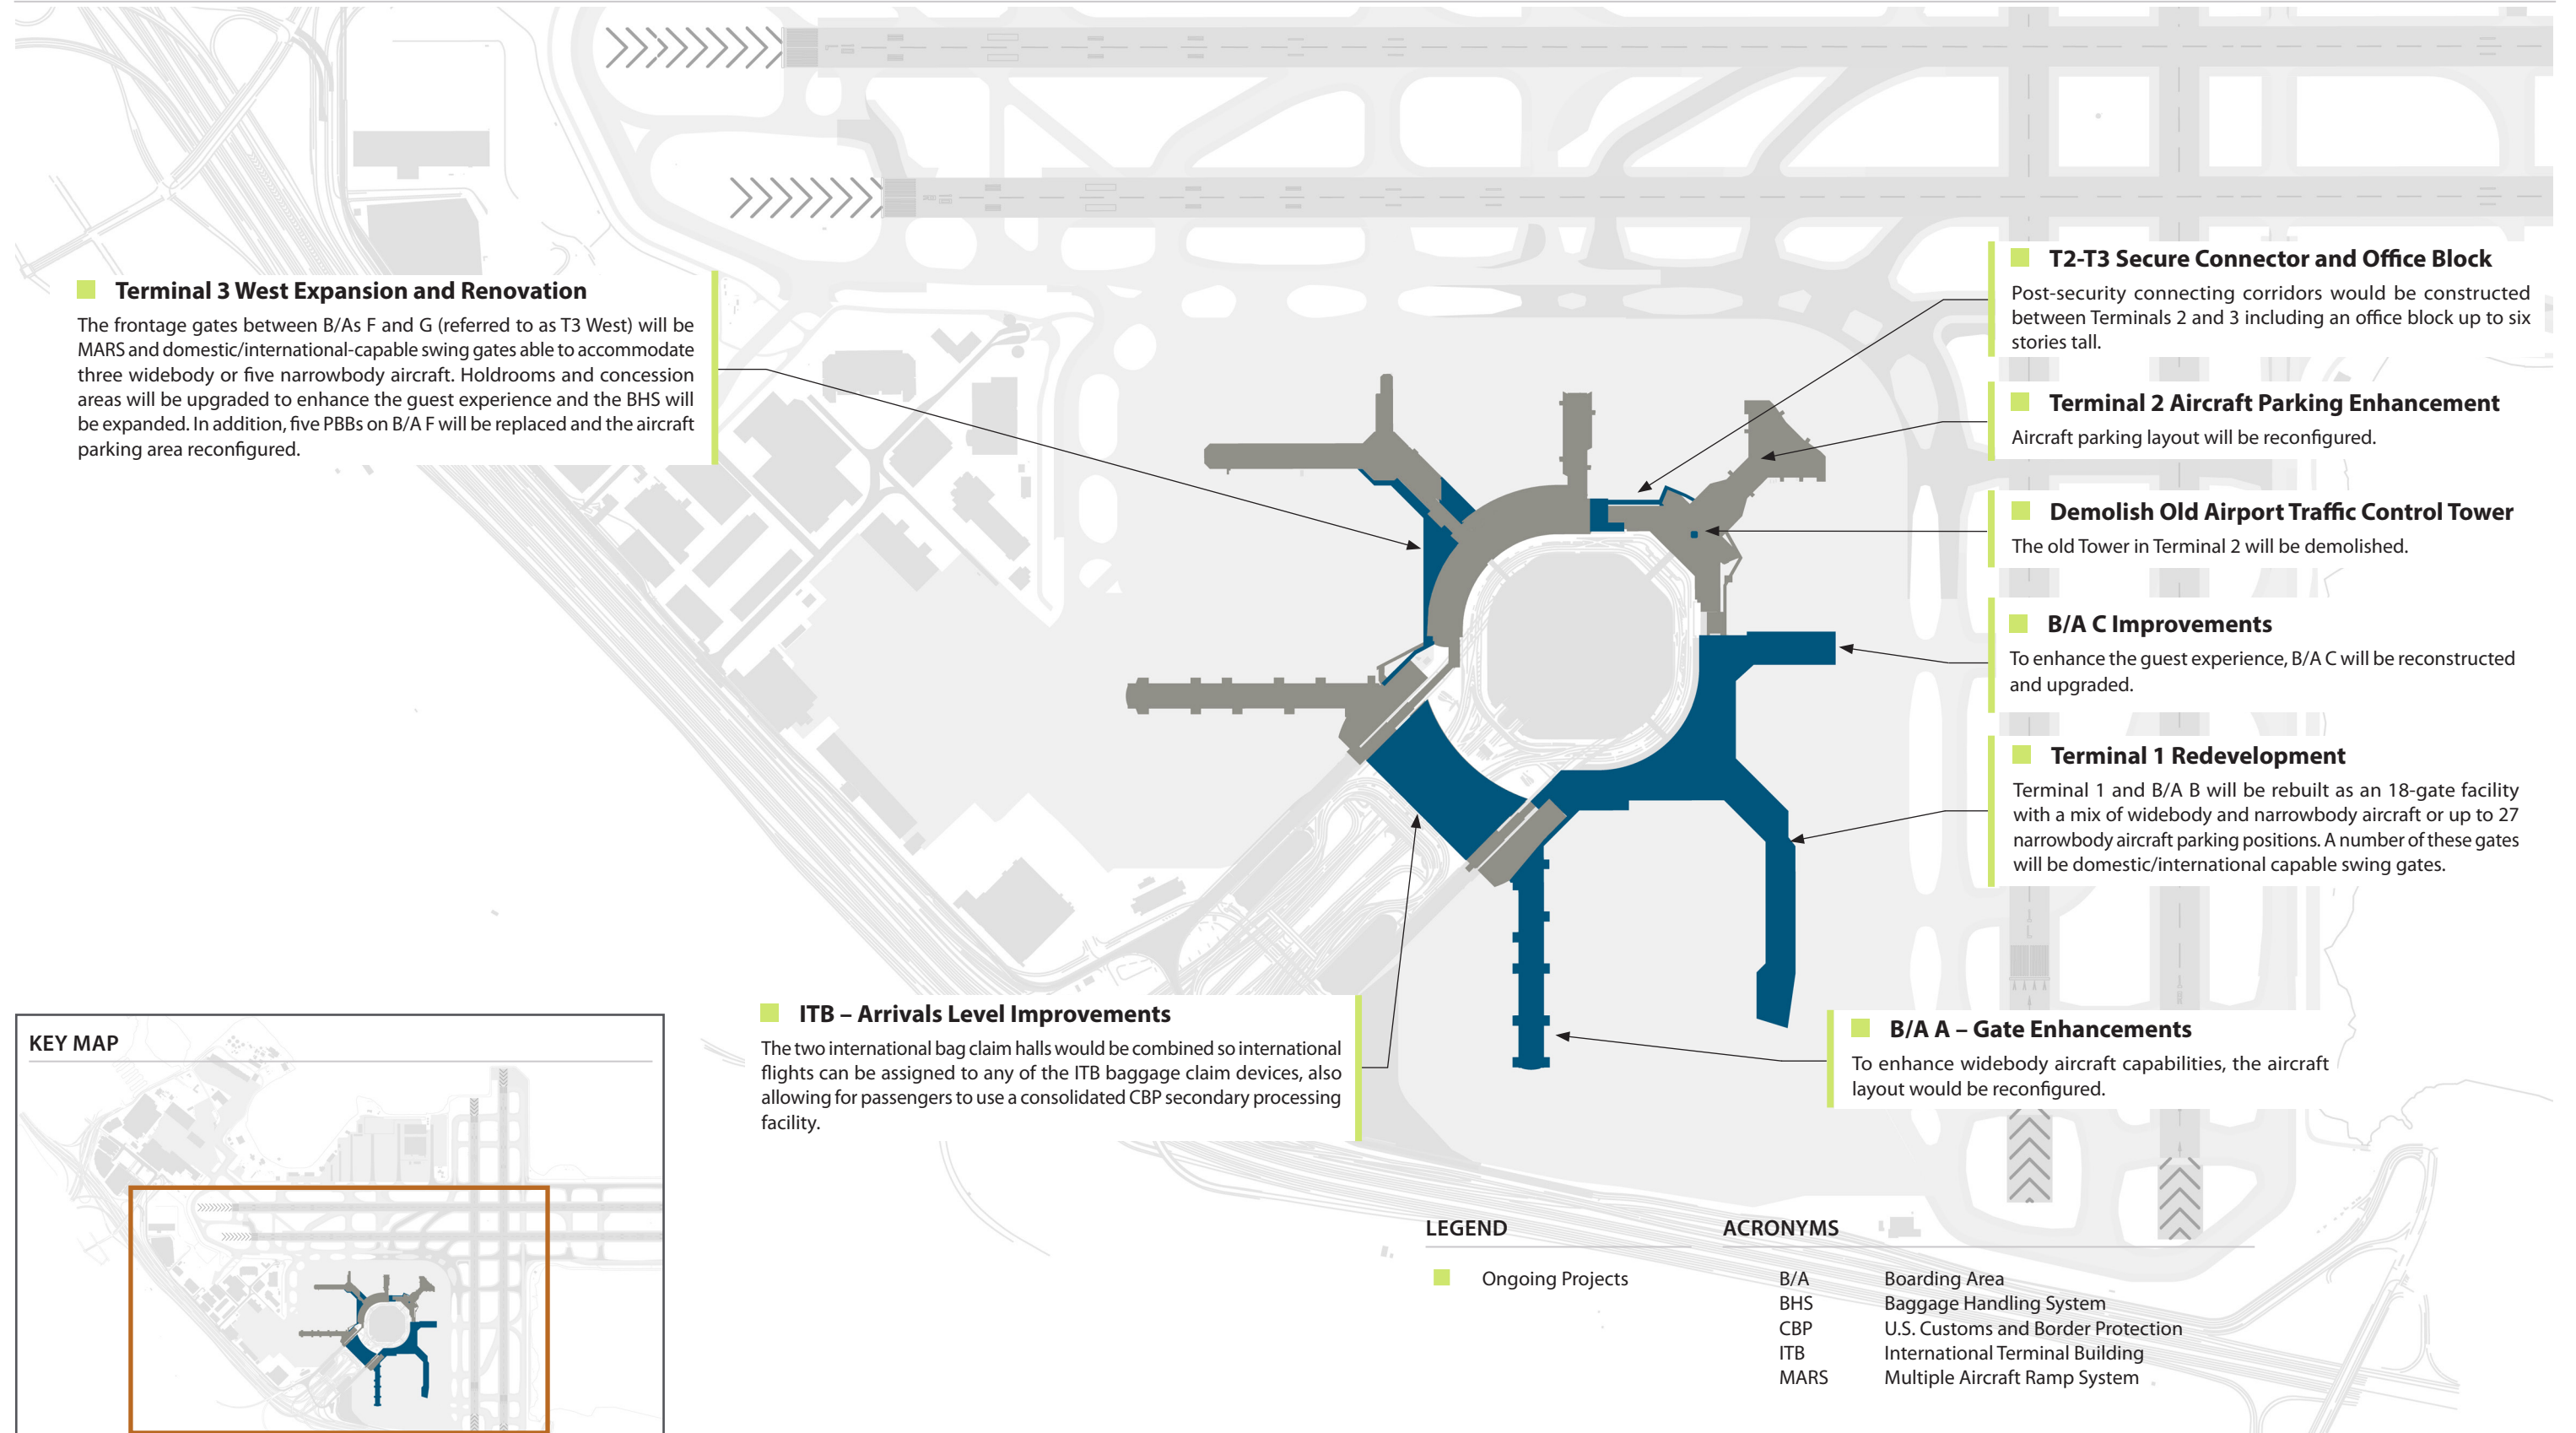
| Terminal 2 Aircraft Parking Enhancement
